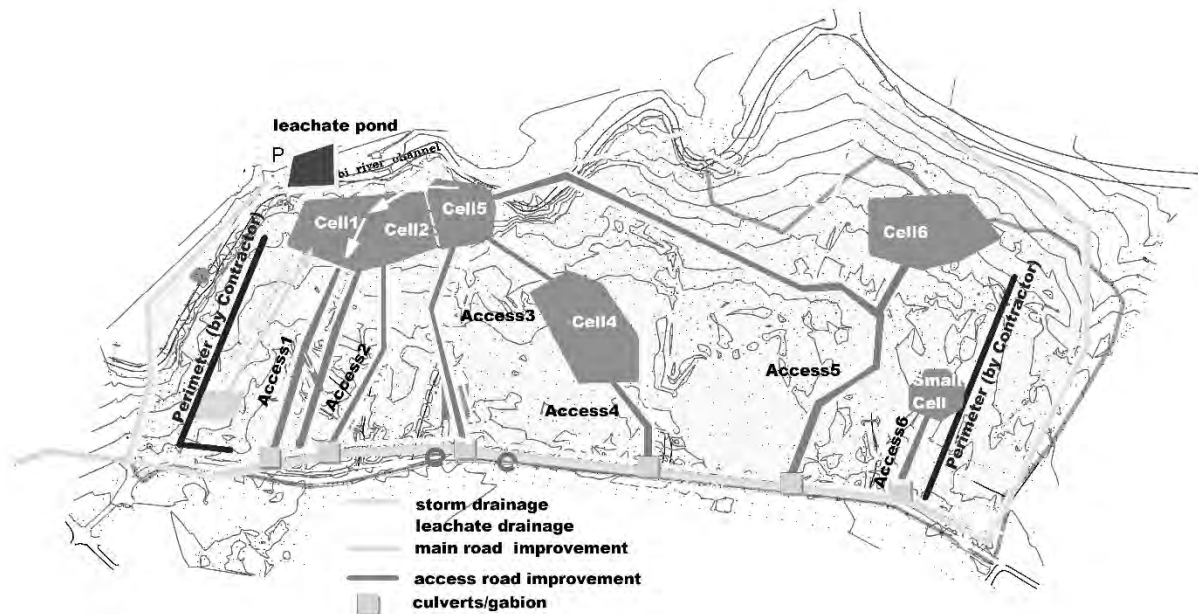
Layout Plan of Dandora Dumpsite in Phase 3
